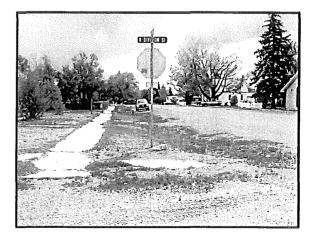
Deteriorated sidewalk and no curb - 1st and Division
